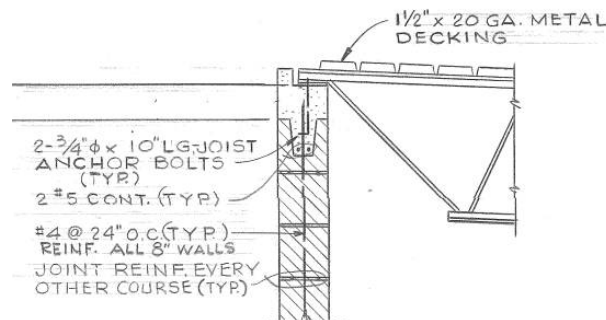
Typical joist-to-wall connection in Buildings 9, 6, 3
